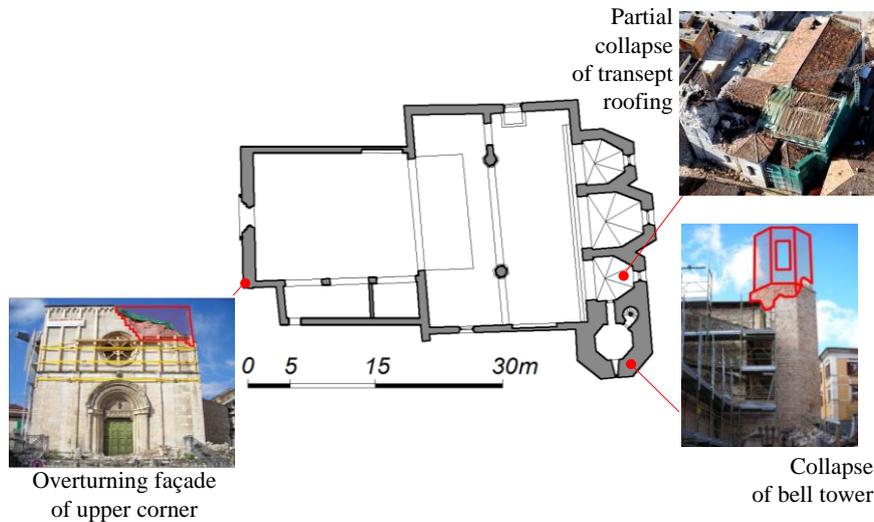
San Pietro di Coppito church (SPC): damage after the 6th April 2009 earthquake.
